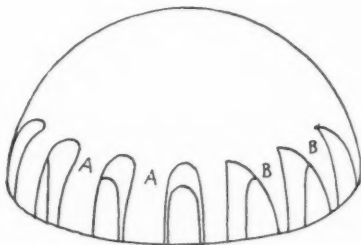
GEOMETRICAL INTERPENETRATION LEAVES UGLY PIERS AT A.A. THE GROIN MAY BE MADE STRAIGHT ON PLAN AS AT B & THE WINDOW VAULT MODELLED TO FIT.
